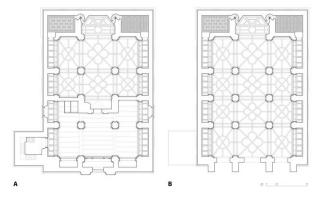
(a) Present-day ground plan and (b) possible original plan
